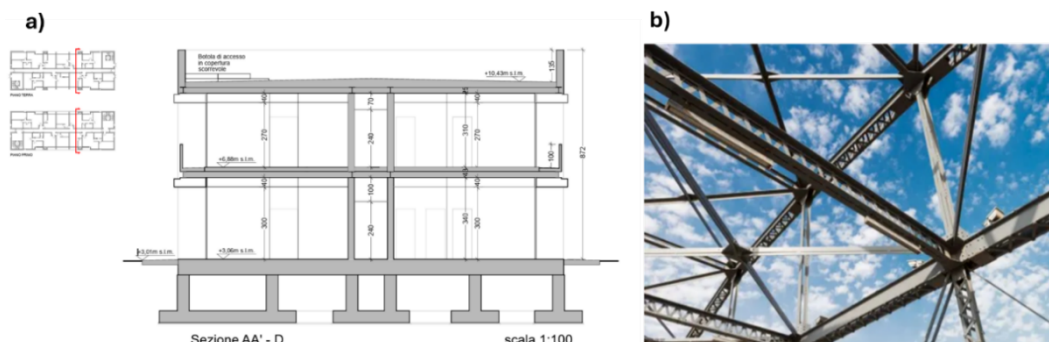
Section of the building showing the load bearing structure (a); a picture of a structure containing steel braces (b).
